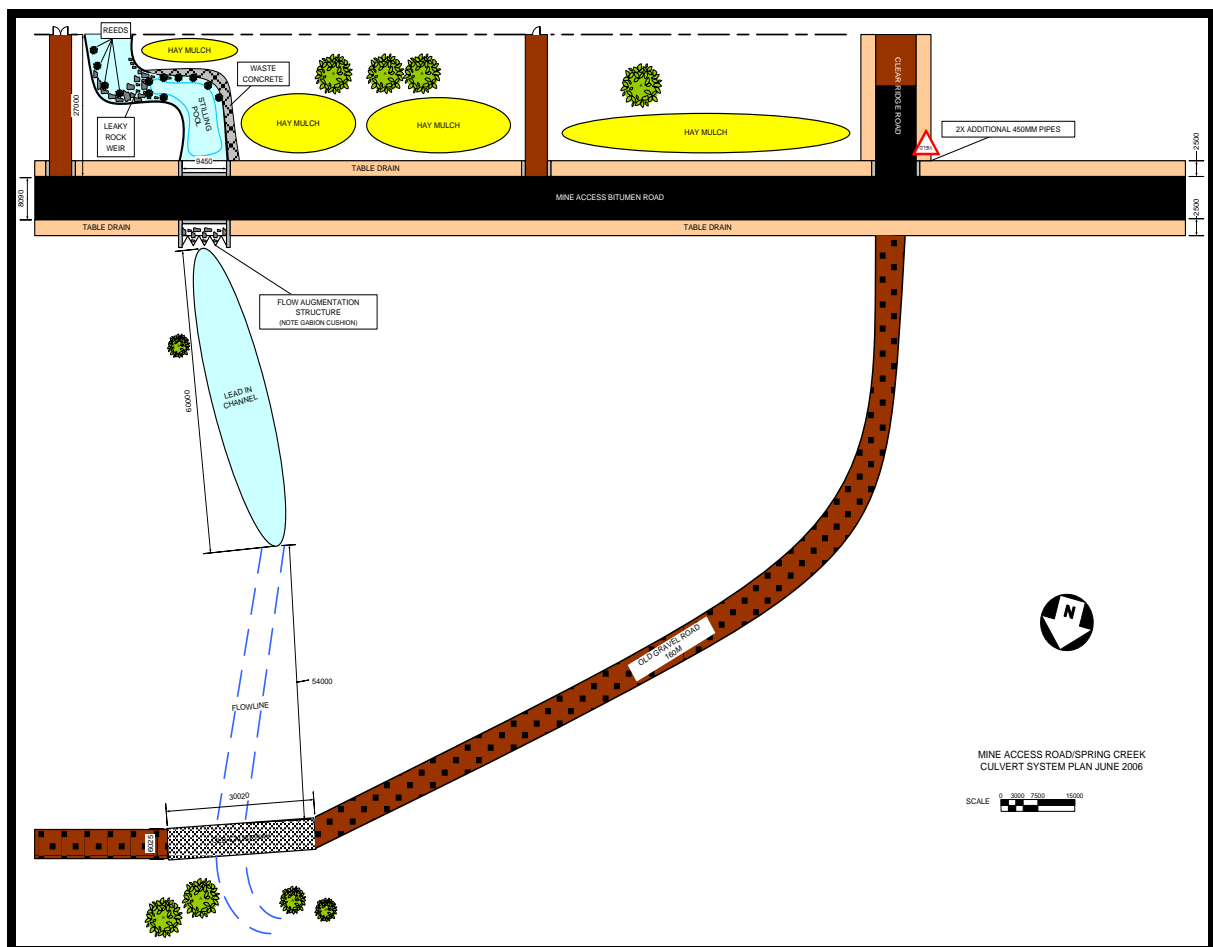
Proposed site plan for Mine Access Road/Spring Creek.
